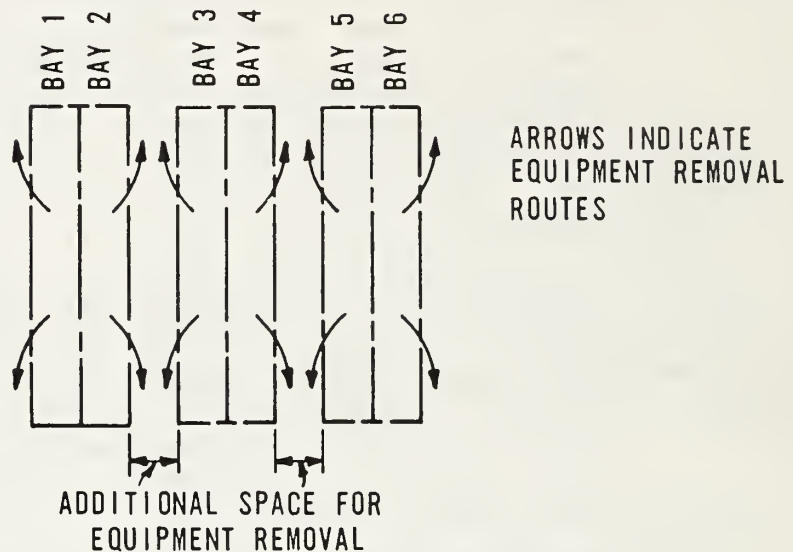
SUBSTATION PLAN VIEW SHOWING
